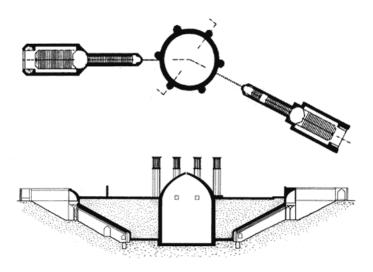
Plan and section of SheshBadgiri Cistern, Yazd [12]
